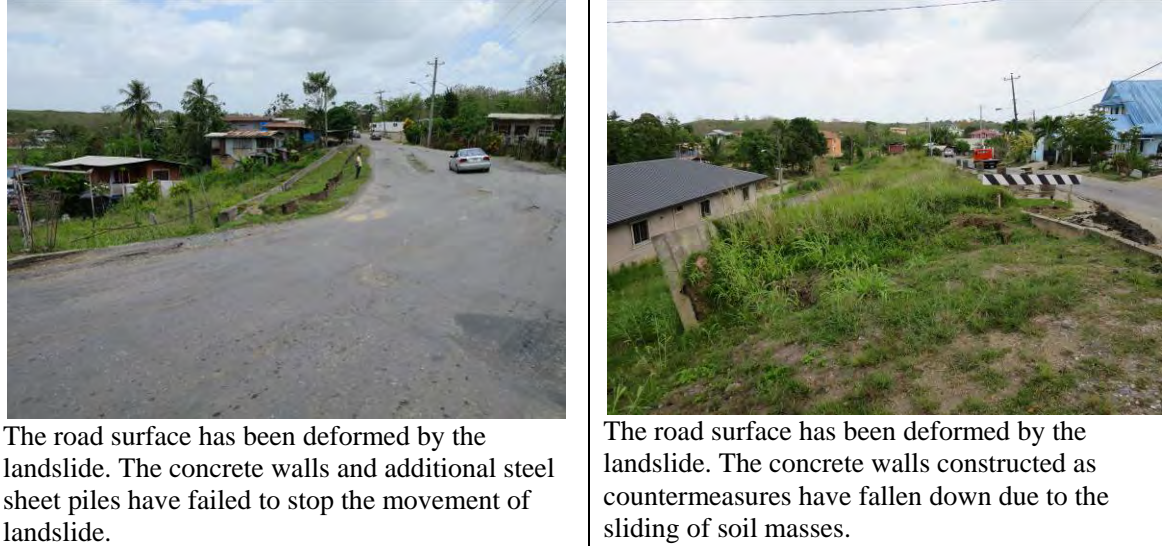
Slope Collapse in North Coast Road in the Trinidad Island
